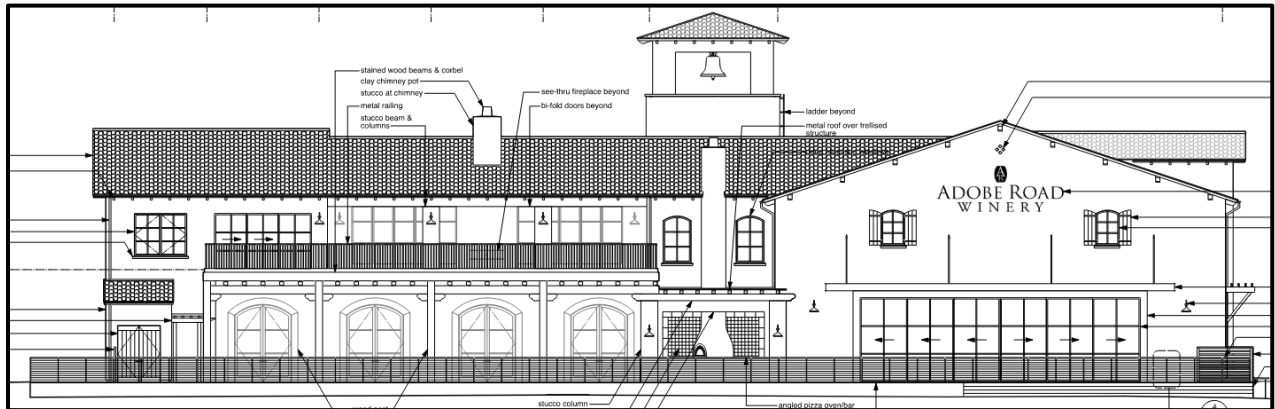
Riverfront Elevation – Approved (Attachment F, Sheet A3.02)
